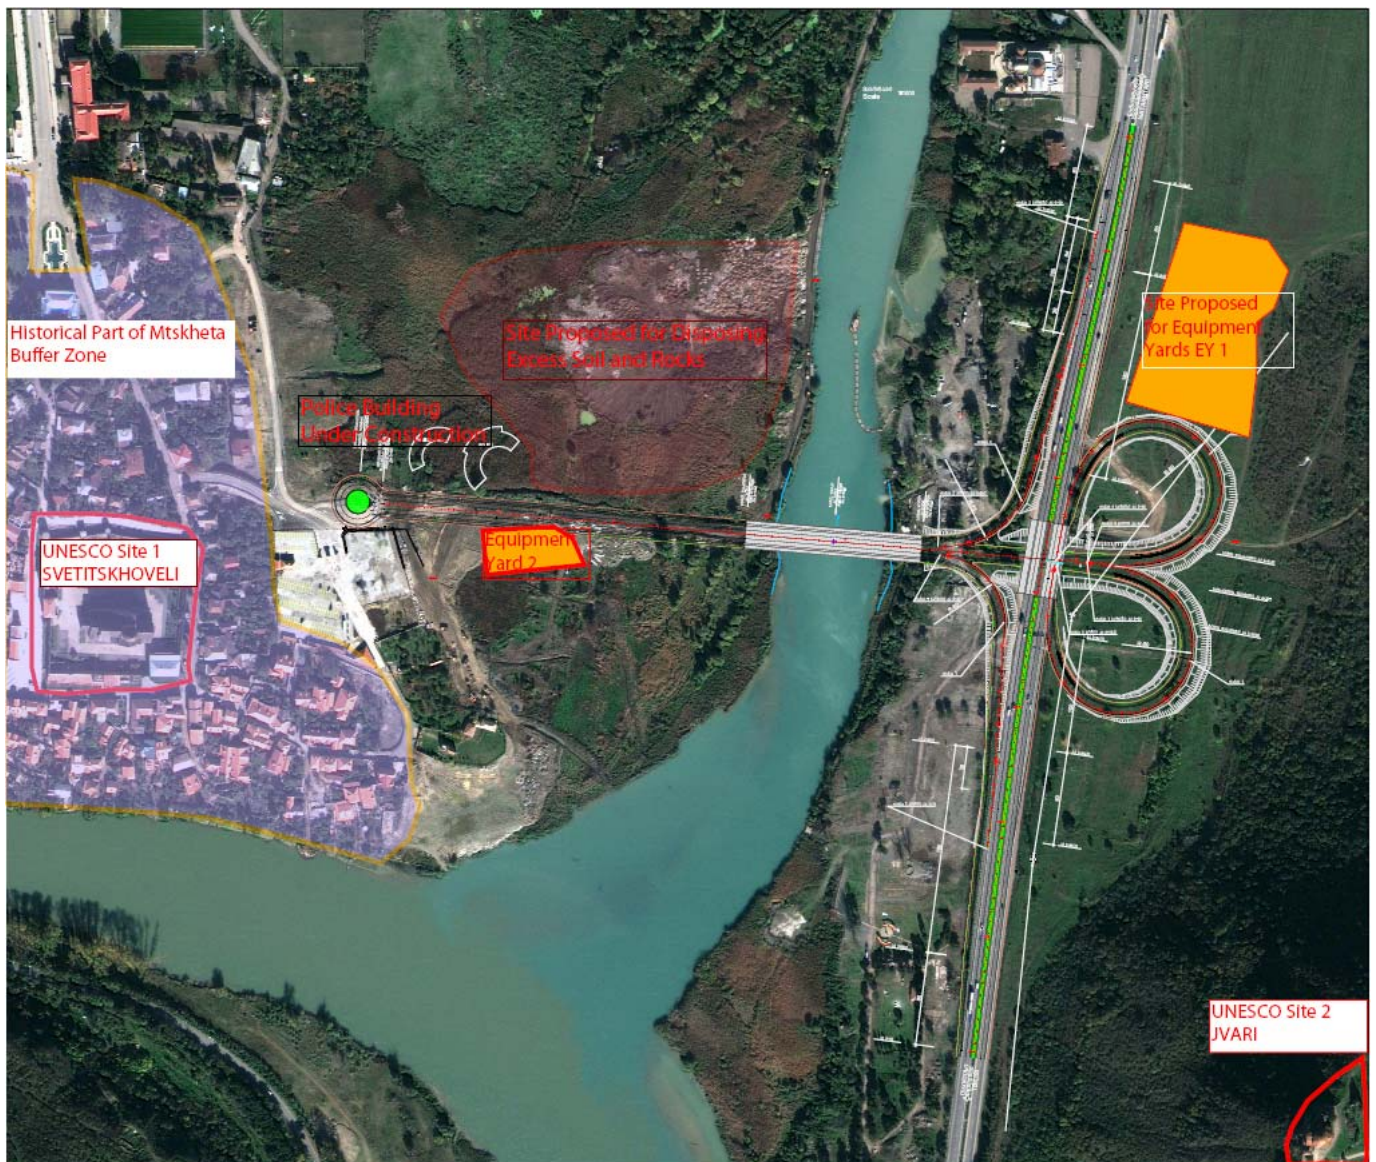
Layout Plan of the of r.Aragvi Bridge and Interchange System
